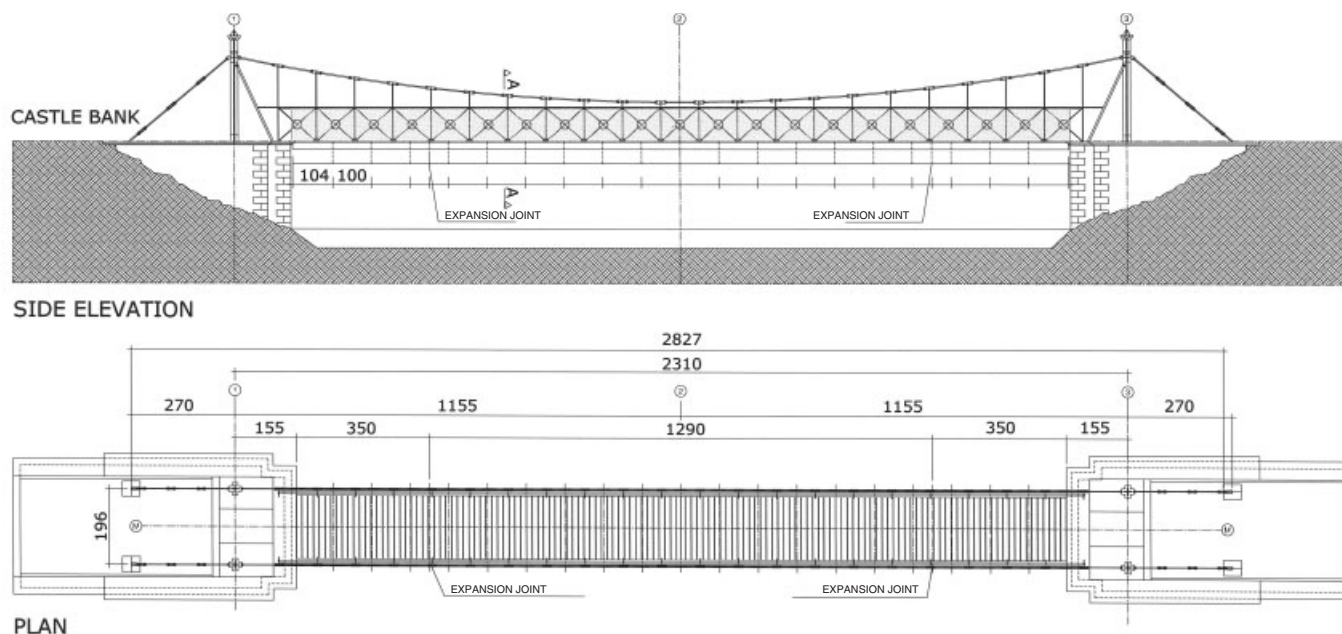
Side elevation of the upgraded suspension bridge with new steel box girder [10]
